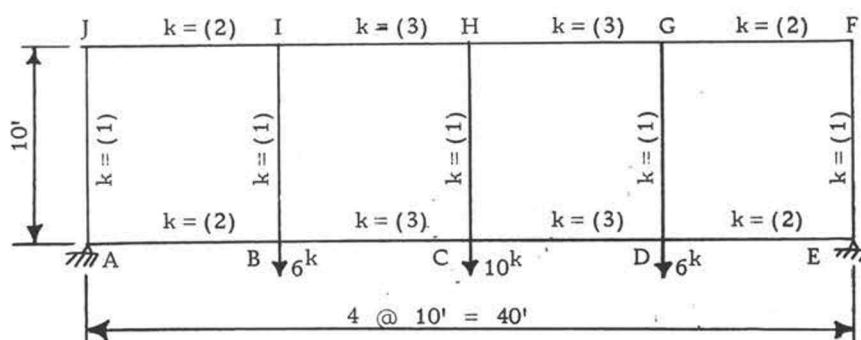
Symmetrically loaded Vierendeel Truss
